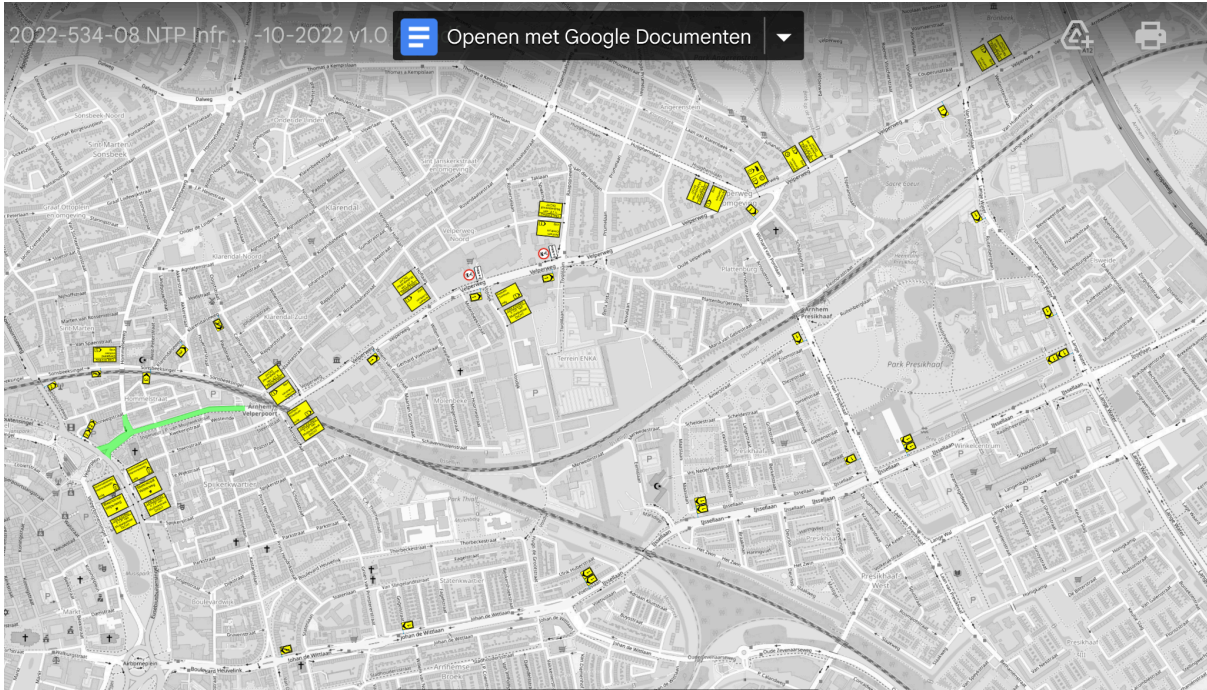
Diversion plan Van Muilwijkstraat
